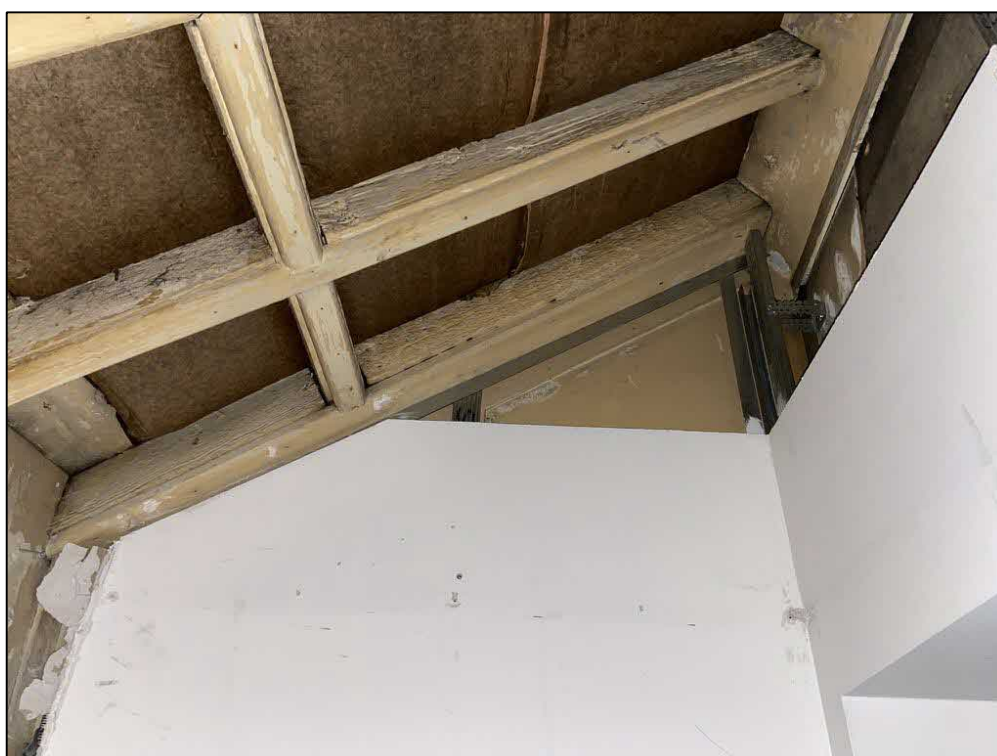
A further internal view of building labelled A. Wooden boarding features beneath the external roof tiles. This boarding is in good condition and features no signs of damage. No signs of previous bat usage were noted within the building section during the survey.
